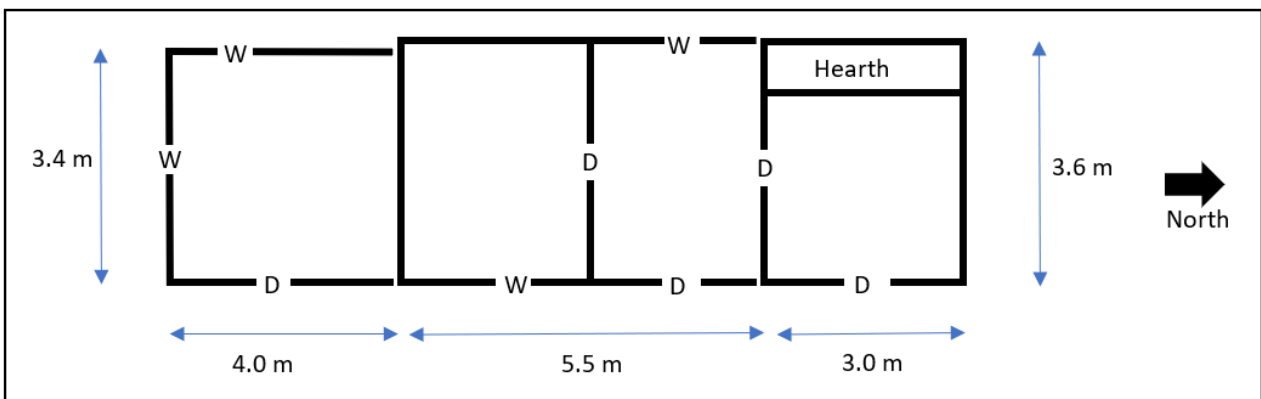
Plan of the ruin at waypoint 158. D = door, W = window.
